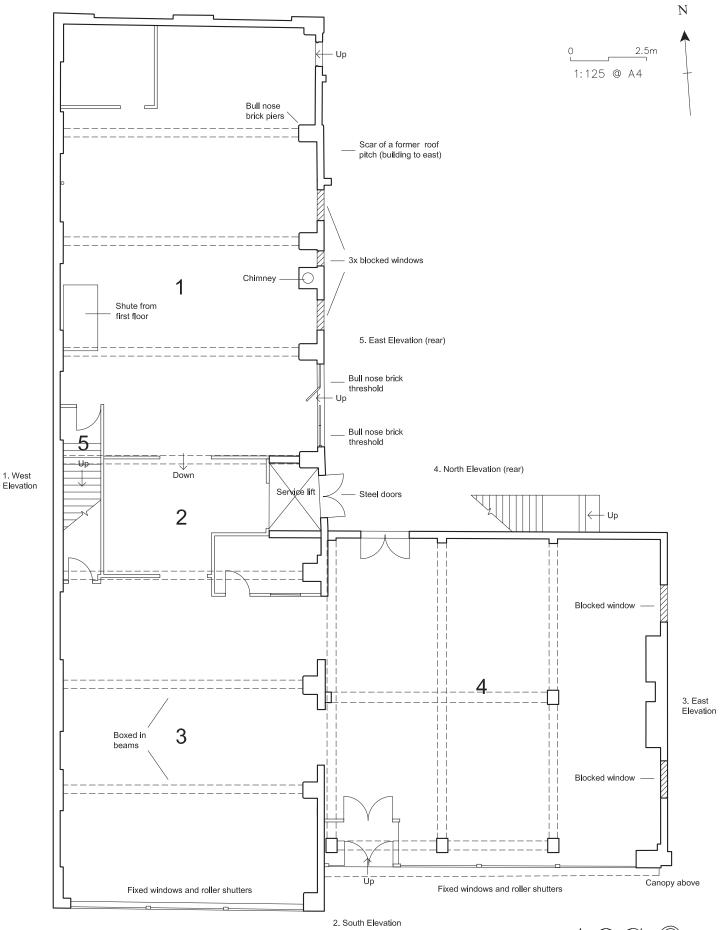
Ground Floor Plan, Location of Elevations and Room Identification
